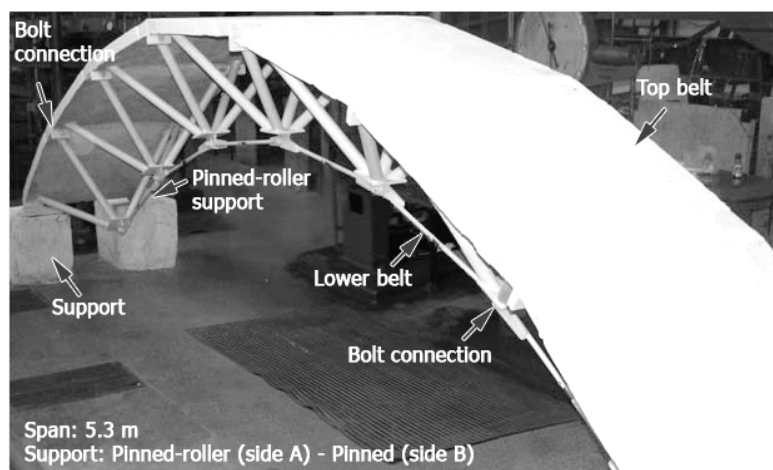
Full-scale experimental sample of the steel and concrete composite cable space frame.
